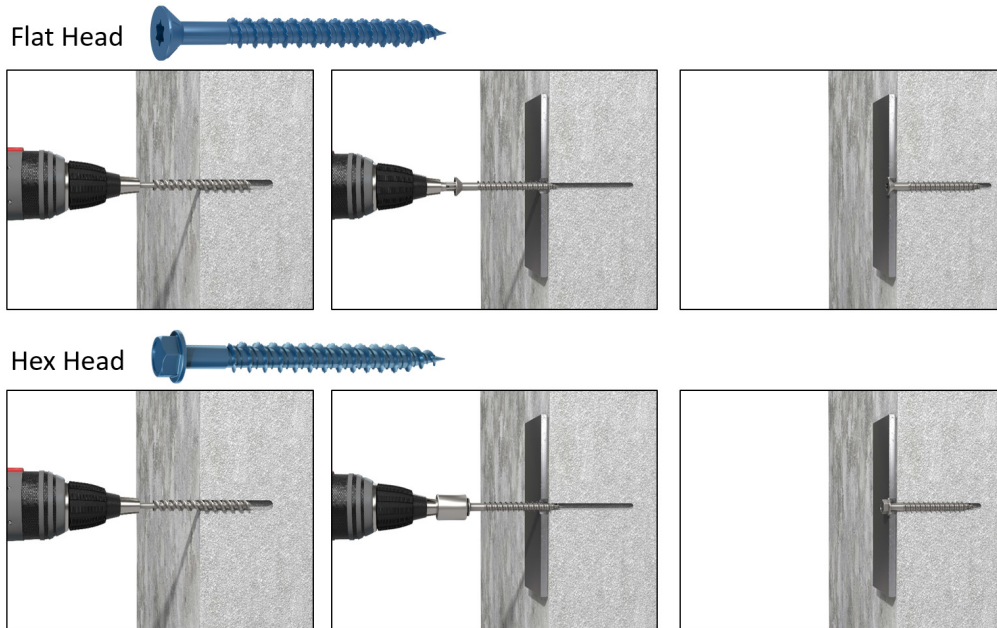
POWER-PRO CONCRETE SCREW ANCHORS AND HEAD STYLES
